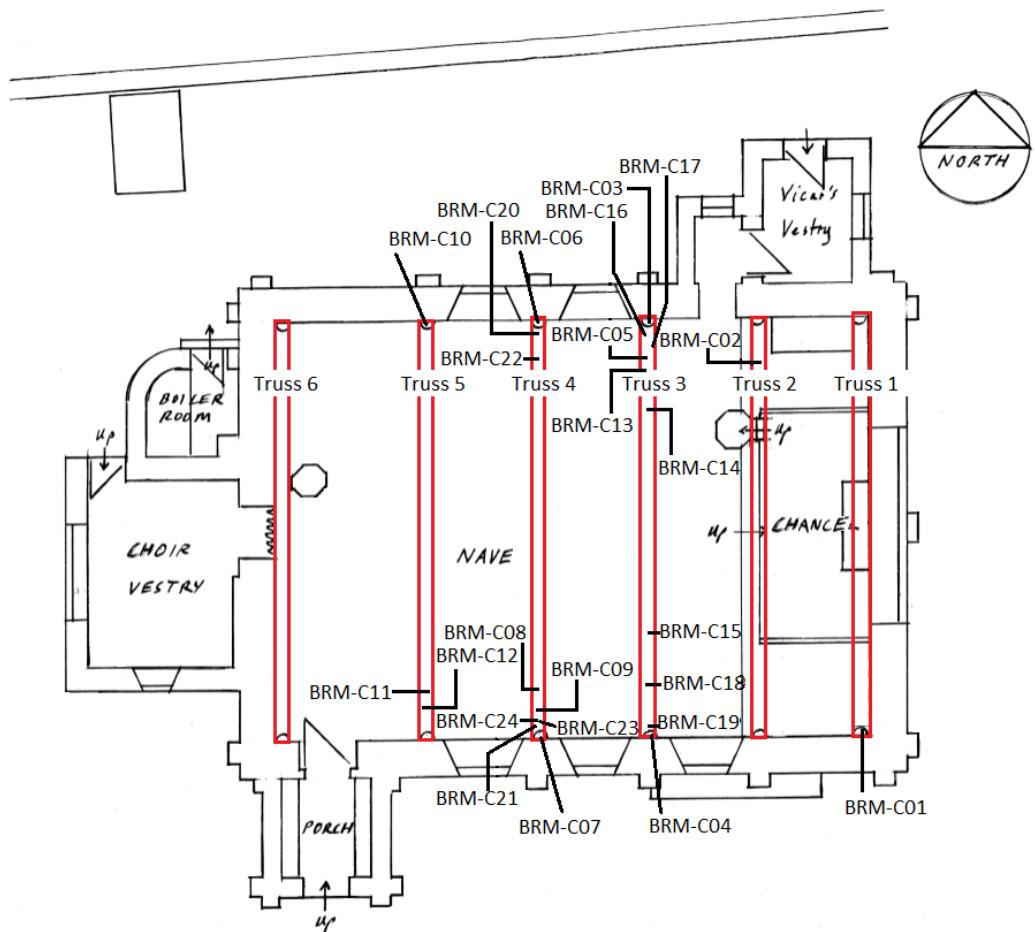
Plan of St Barnabas' Church, showing truss numbering, and the location of samples BRM-C01–24 (after Hook Mason Architecture)
